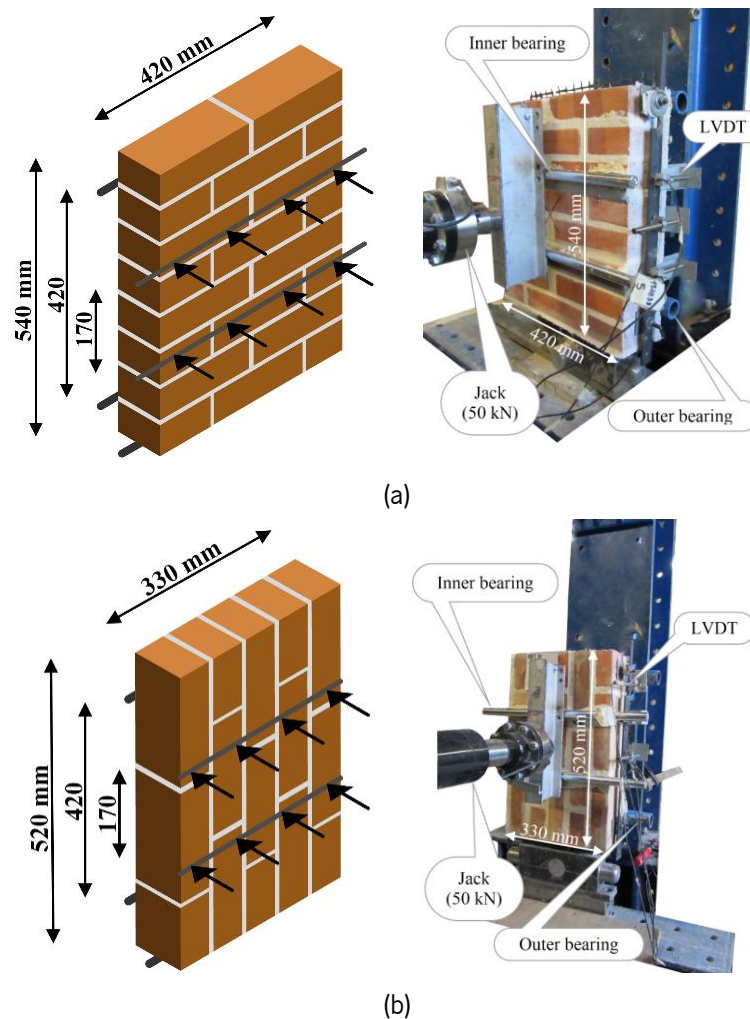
Geometric details and test setups used for out-of-plane tests: (a) bending tests parallel to bed joint; (b) bending tests, normal to bed joints.
